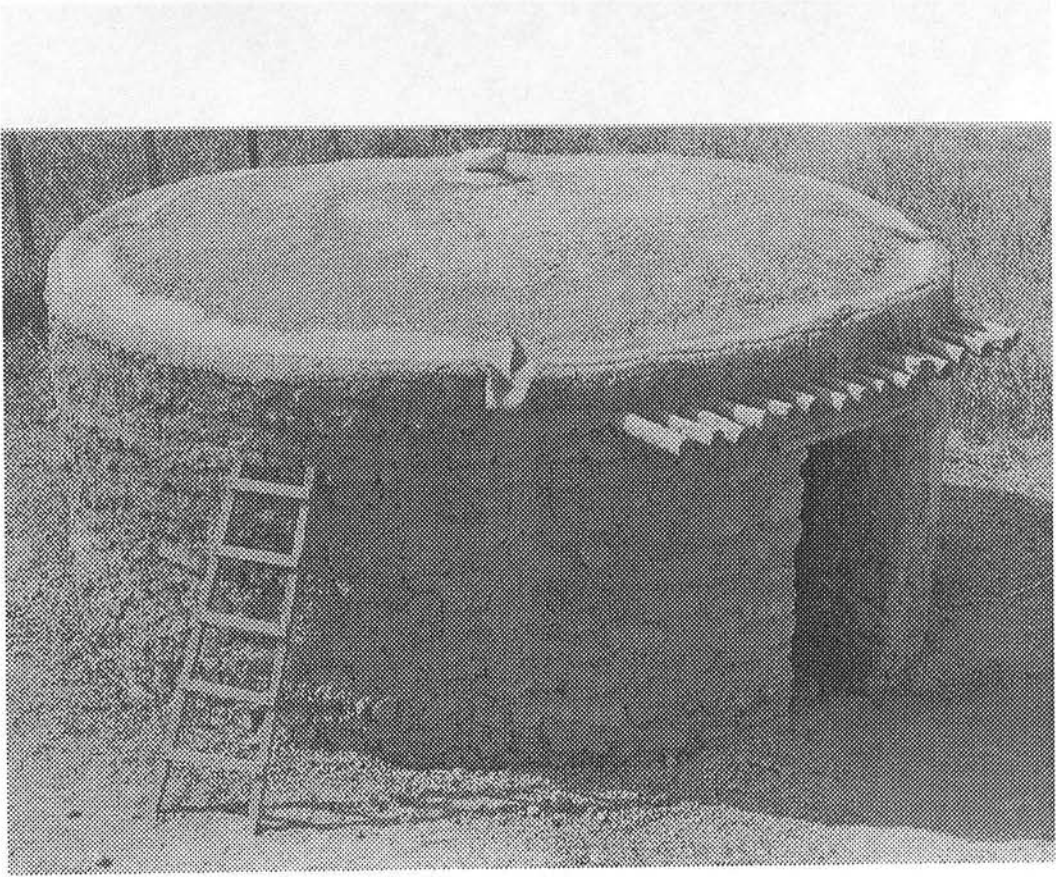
LEV, RH2 completed structure before the application of the mud render. Note the roof gutters and drains.
